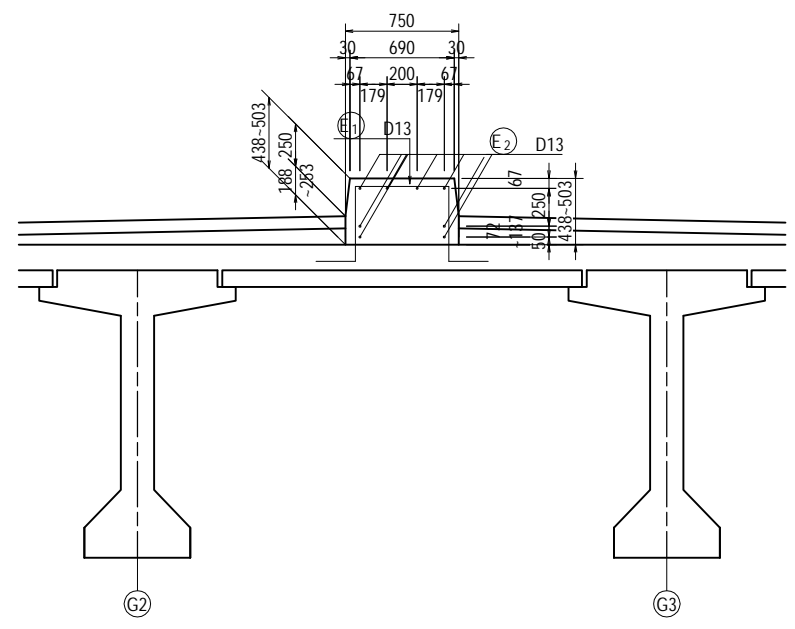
# DETAIL OF CONCRETE CURB, BARRIER AND MEDIUM (PF5-PF7) (3)
